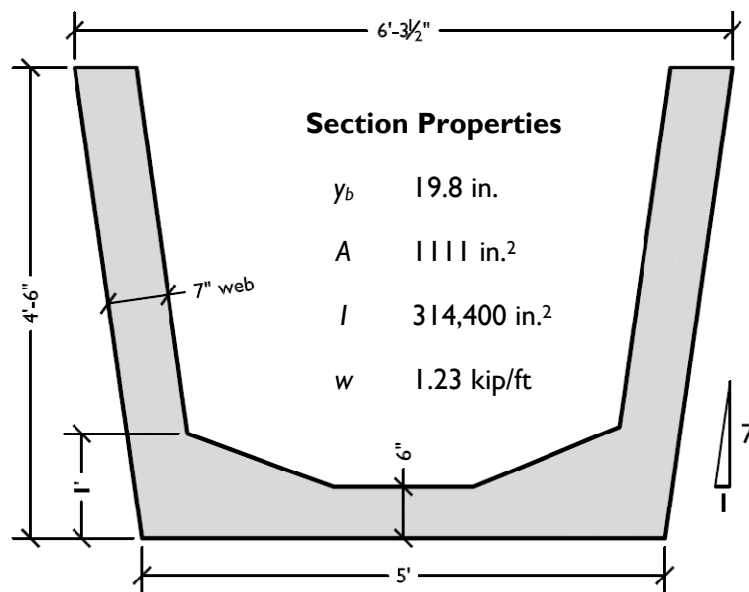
Washington trapezoidal-tub-girder section properties (54 in. standard)
